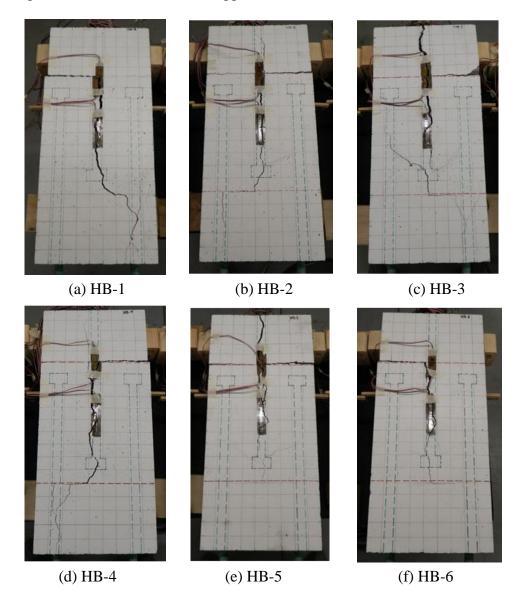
Headed Bar Pullout Samples Crack Pattern
